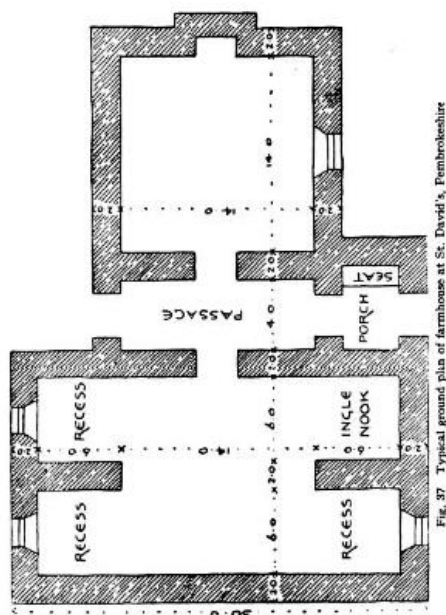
Typical ground plan of farmhouse at St. David's, Pembrokeshire
